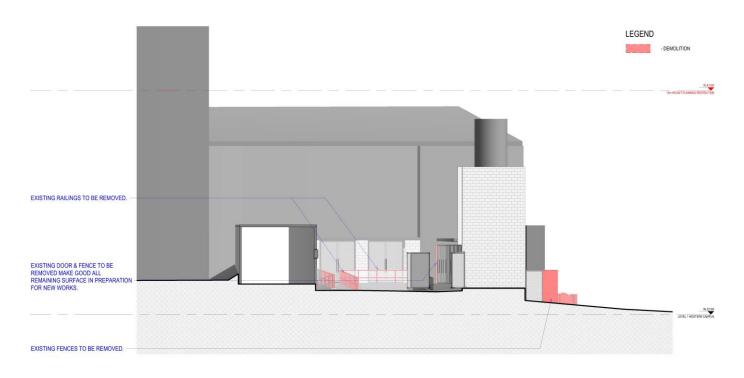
Demolition Elevation 2 (Refer to Elevation 1-2 in Figure 4)
